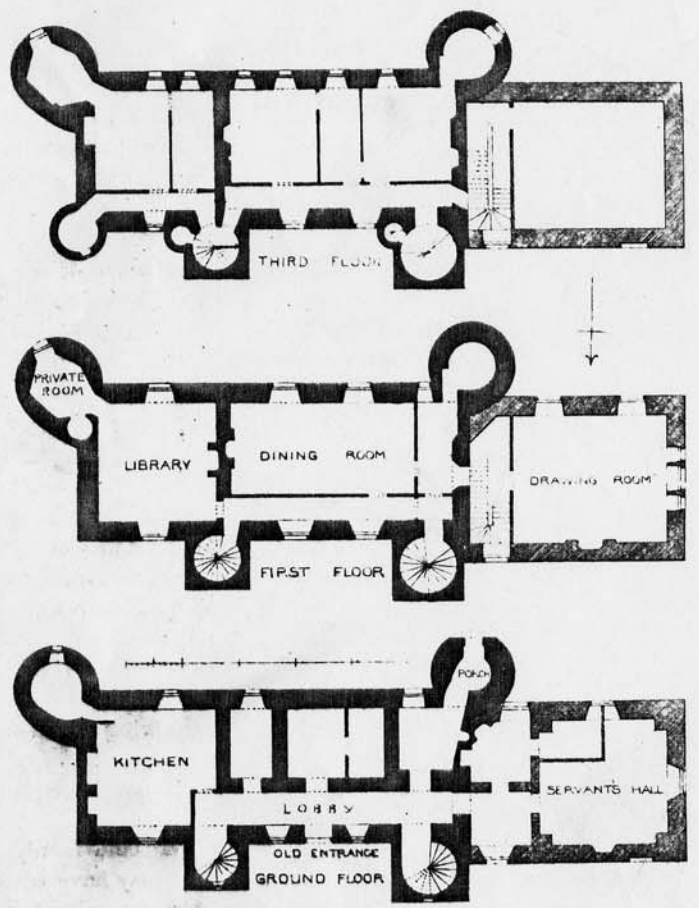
Nesbit Castle. Plans of Ground Floor, First Floor, and Third Floor.
